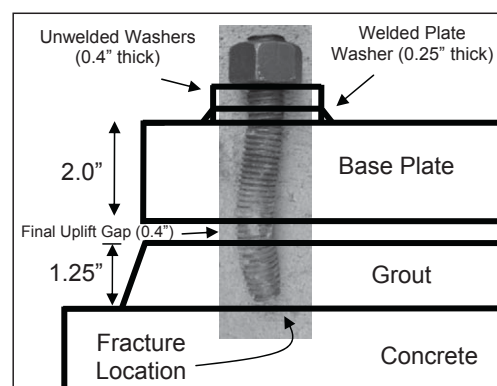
Deformed anchor rod from test 4 superimposed on base plate assembly detail.
